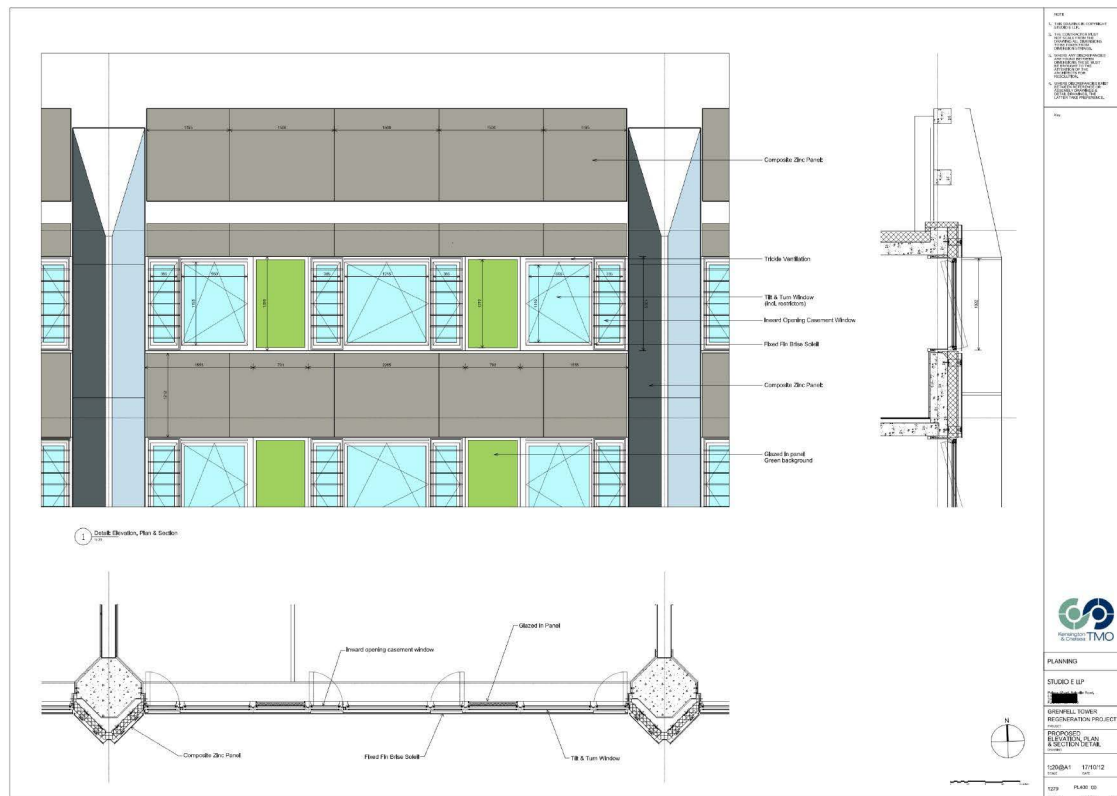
Extract from Studio E drawing 1279 PL400 00' Proposed Elevation, Plan & Section Detail' {HAR00010404}
